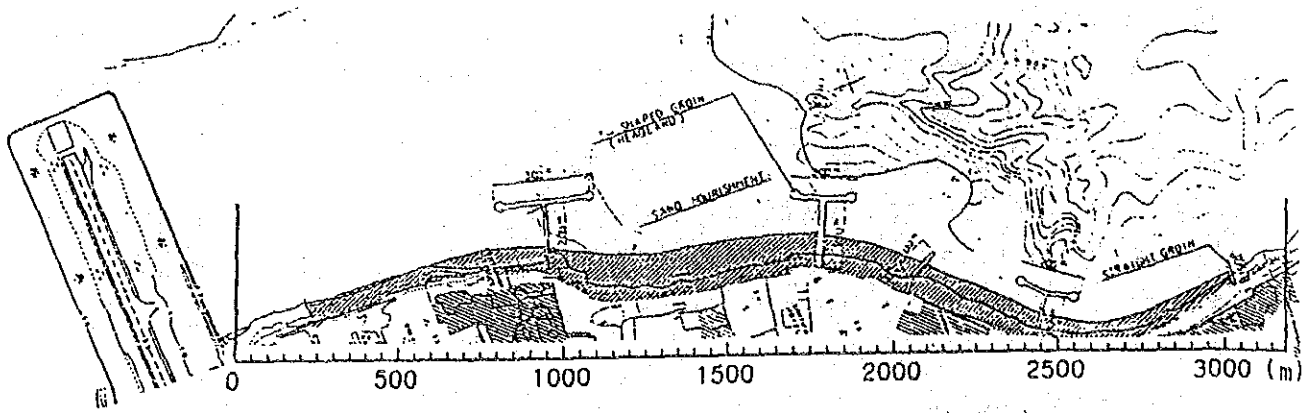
Proposed Plan 1 (Kuta)
